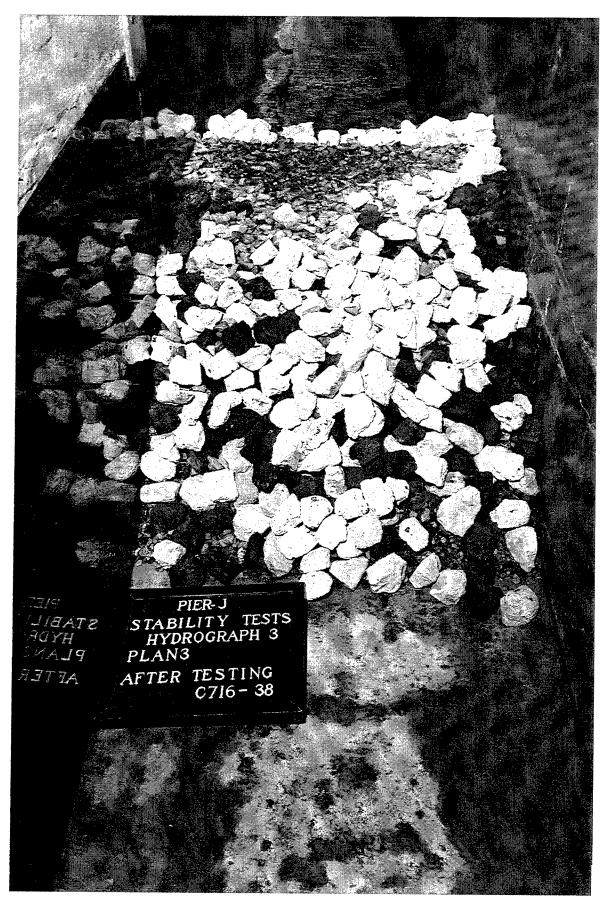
Harbor-side view of Plan 3 at the conclusion of testing
